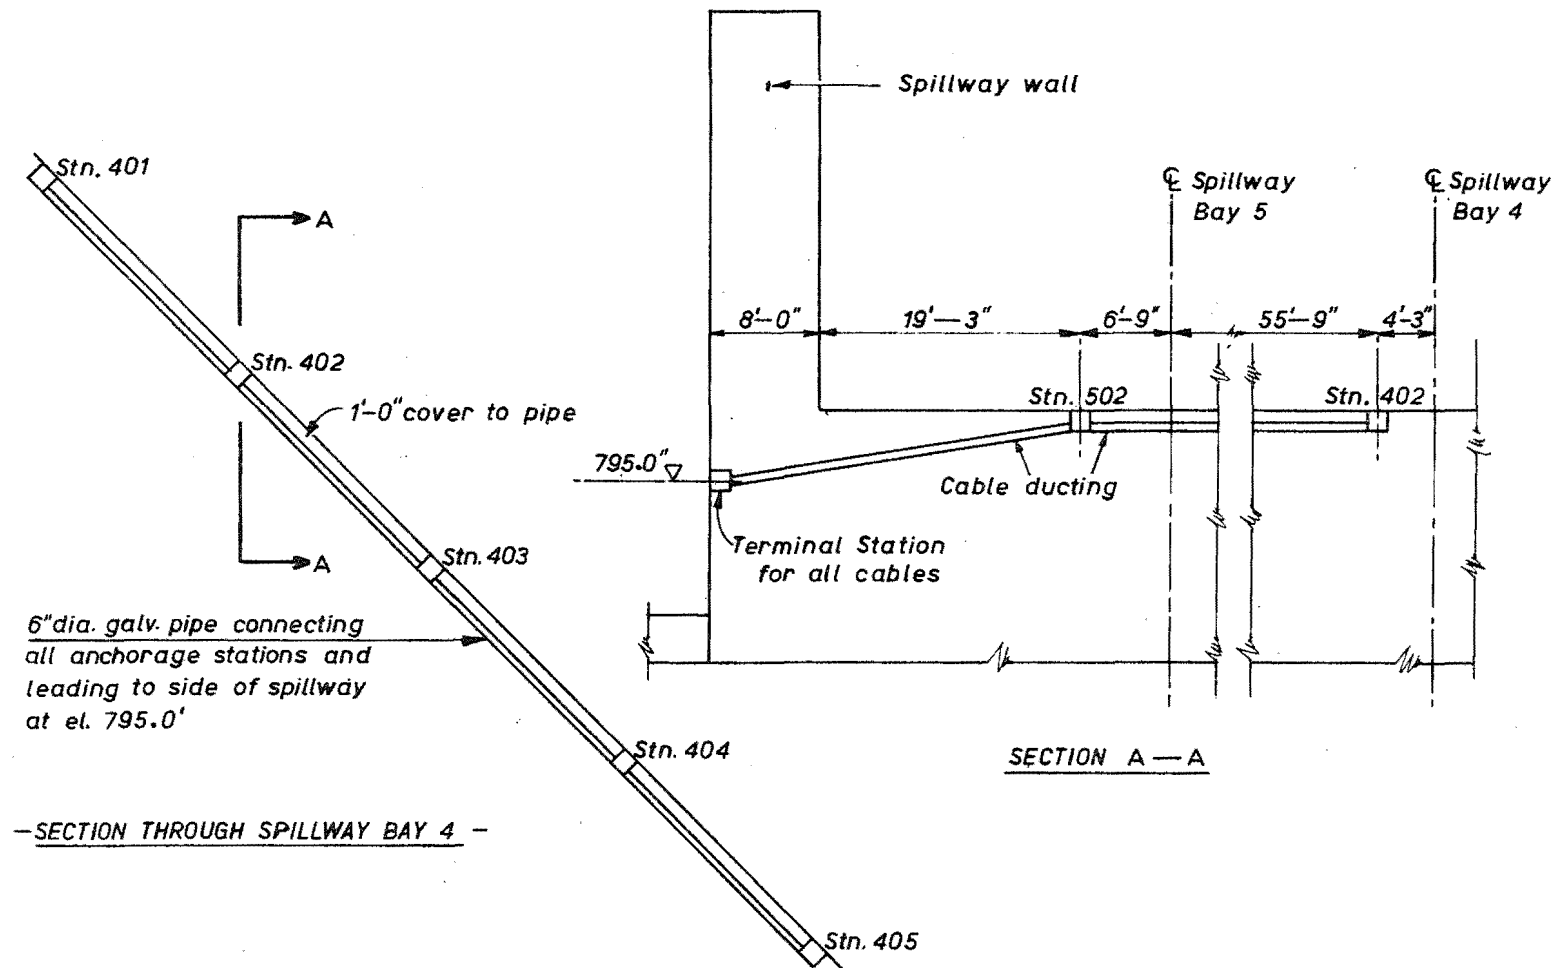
CABLE DUCTING LAYOUT ON SPILLWAY
